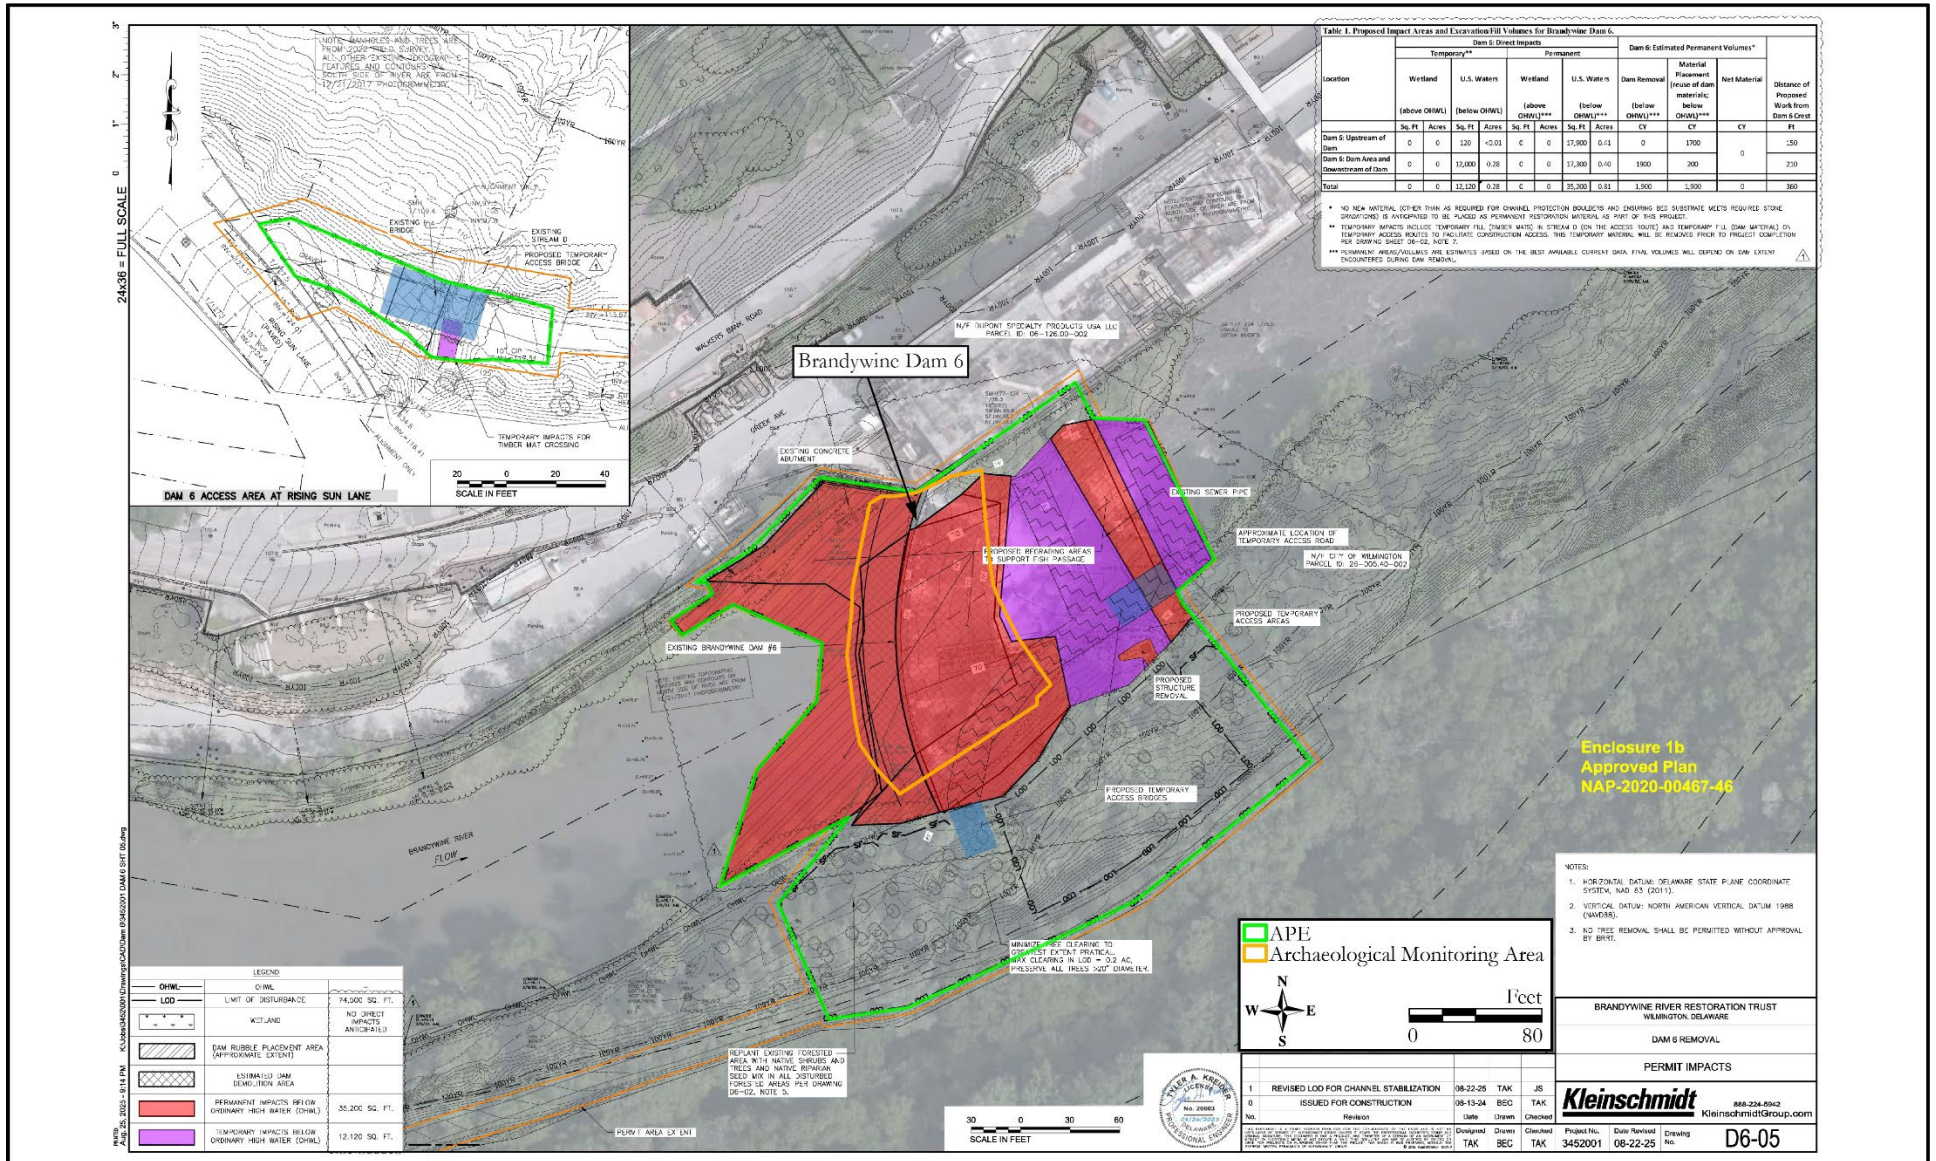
Proposed construction plan showing the APE and Archaeological Monitoring Area (from Kleinschmidt 2025).
